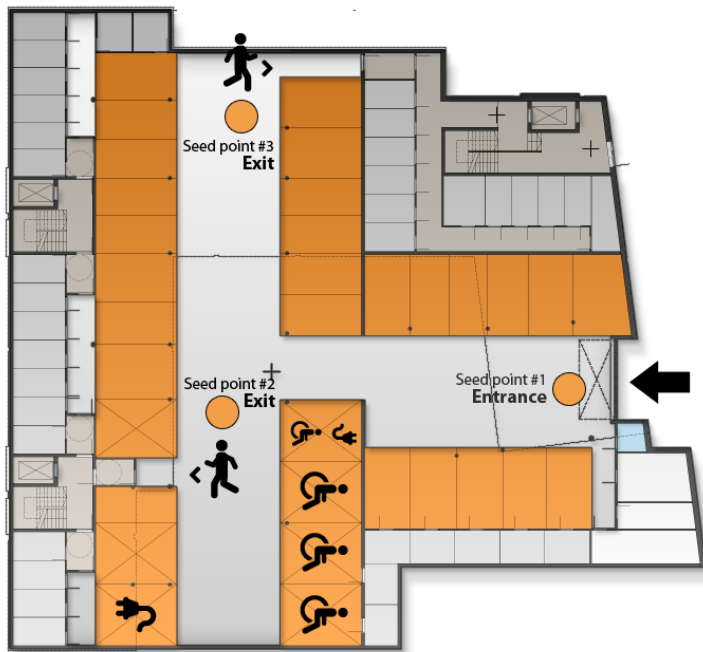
Teaterkvarteret 1.akt floorplan and apartments
